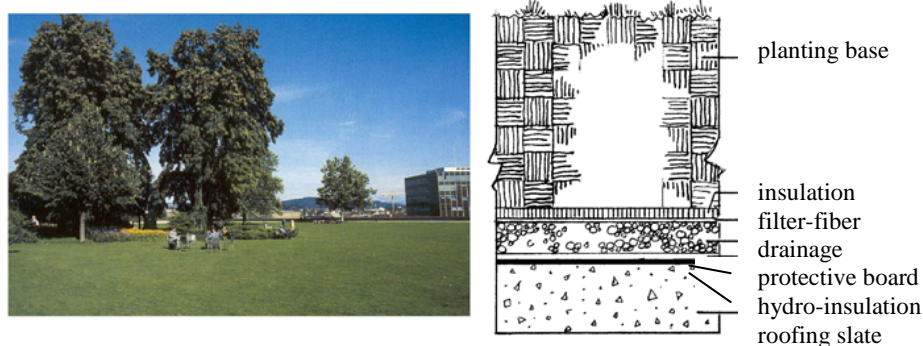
High poplar trees planted in the lowed planting beds laid over steel supported columns of the building (left), and a cross-section of details of the garden in *Grosse schanze park* (right)
